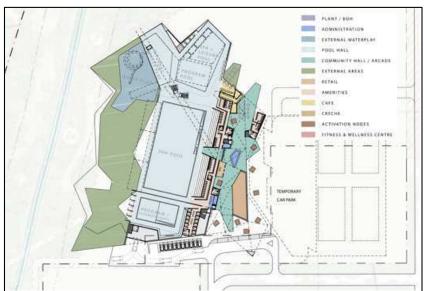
Woodward Place (Whitlam Leisure Centre) Site Plan
